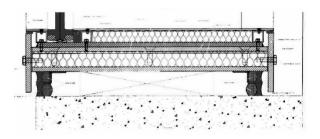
Schematic drawing of the glass sample and frame (cross section)
